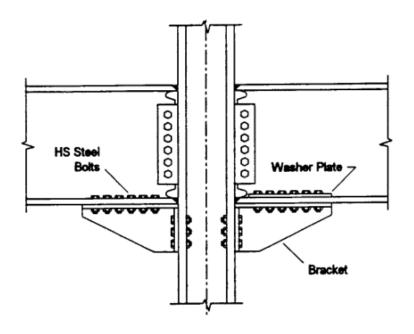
Bolted Bracket Connection, Haunch Type
